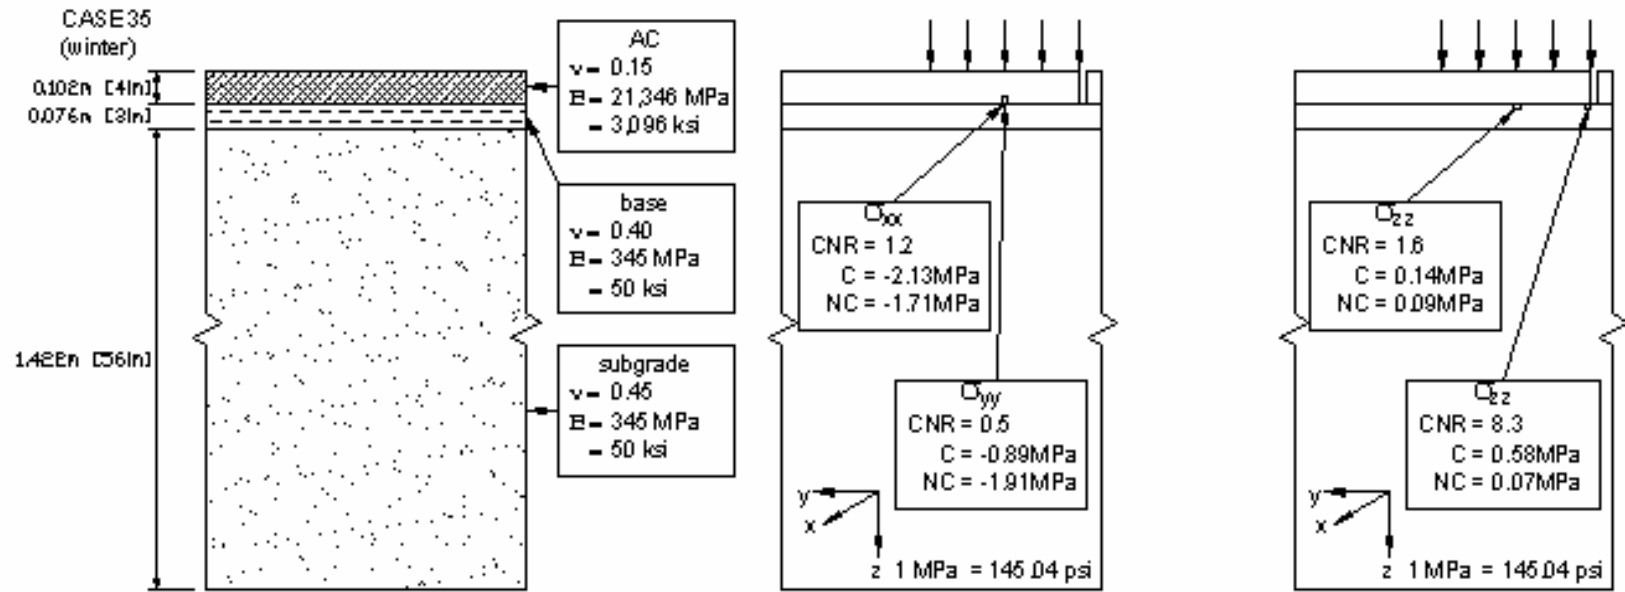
Summary cross section for case 35, (C – stress in cracked pavement, NC – stress in pavement with no crack, CNR – crack/no crack (stress) ratio)
